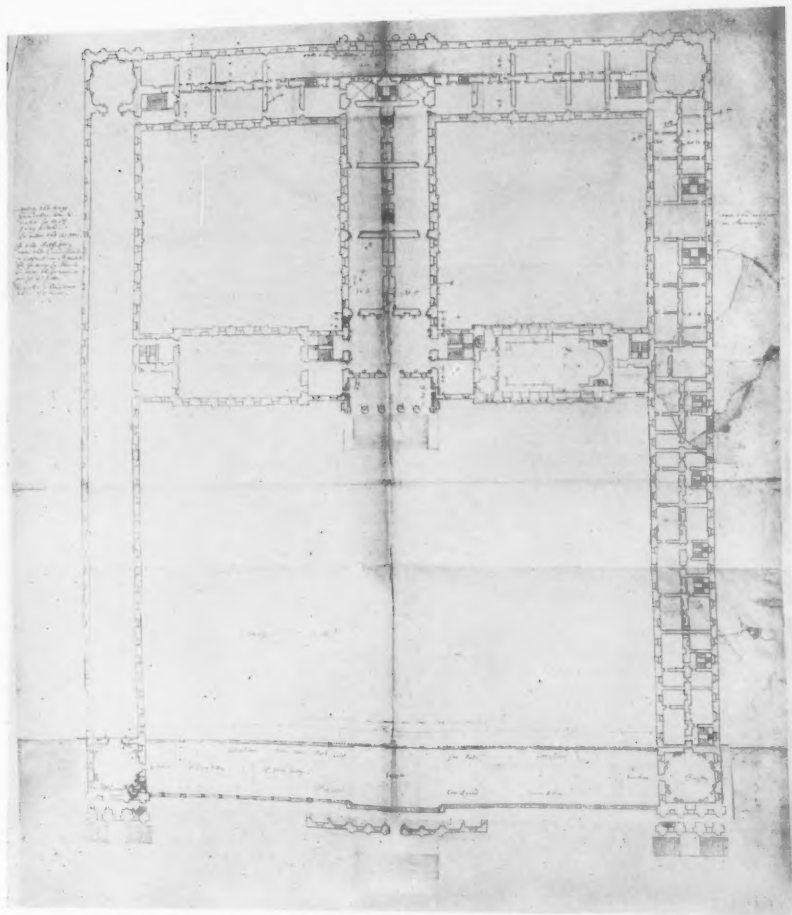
GROUND-FLOOR PLAN, CHATSWORTH A. SCHEME, BY WEBB
